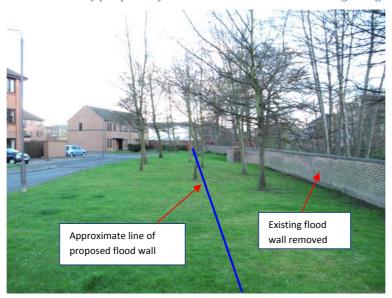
Location of proposed flood wall at Etruria Gardens (facing south)
